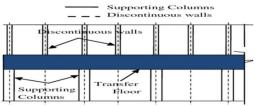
Transfer floor along with column sections [P.S. Lande et.al (2018)]
